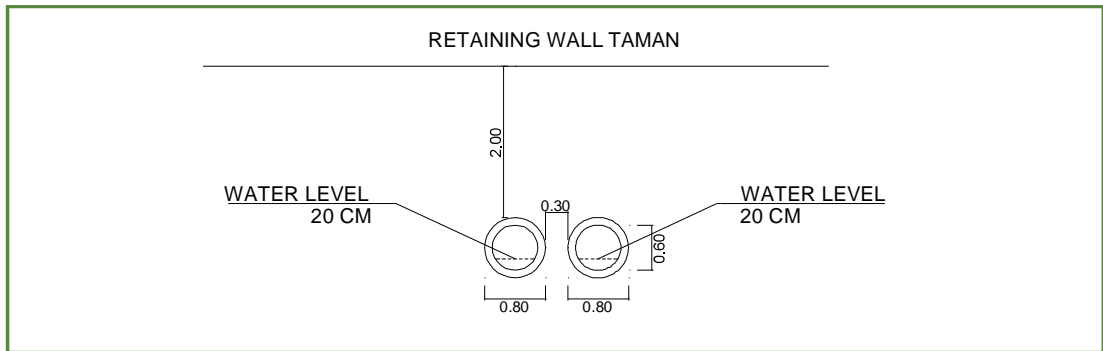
DETAIL OF CULVERT-2 (TAMBORA AREA-2)
